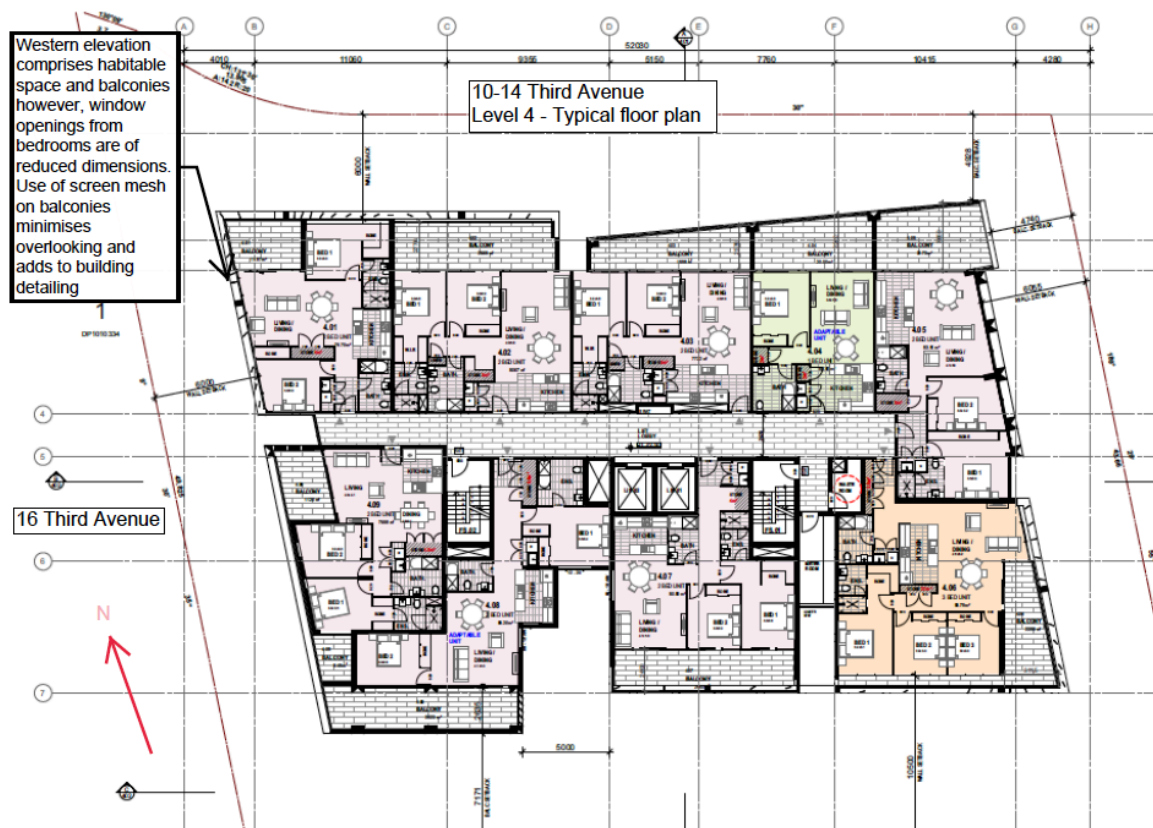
Typical floor plan of proposed building (Level 4 shown)
